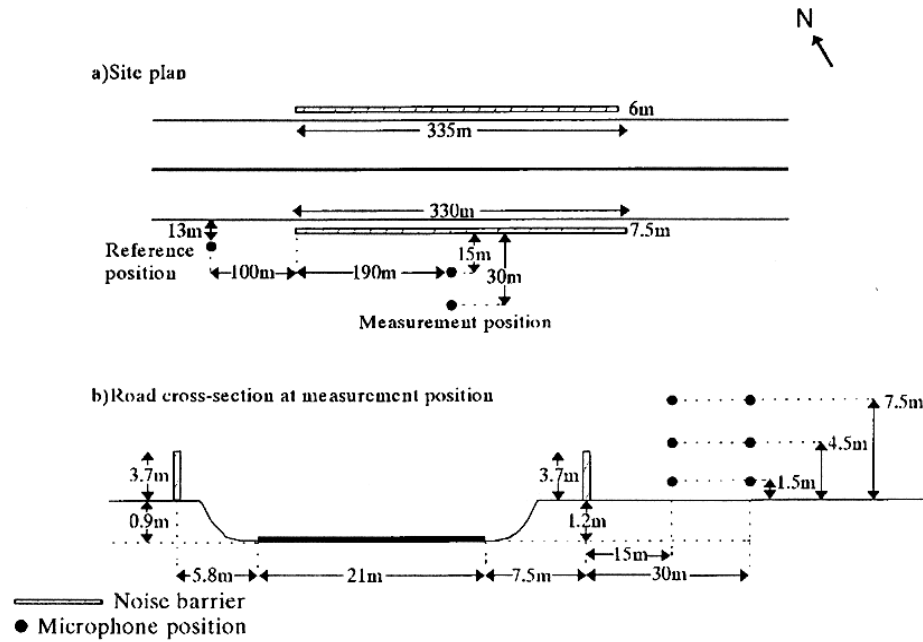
Parallel Barrier Site Details: (a) Site Plan; (b) Road Cross-Section At Measurement Point.
